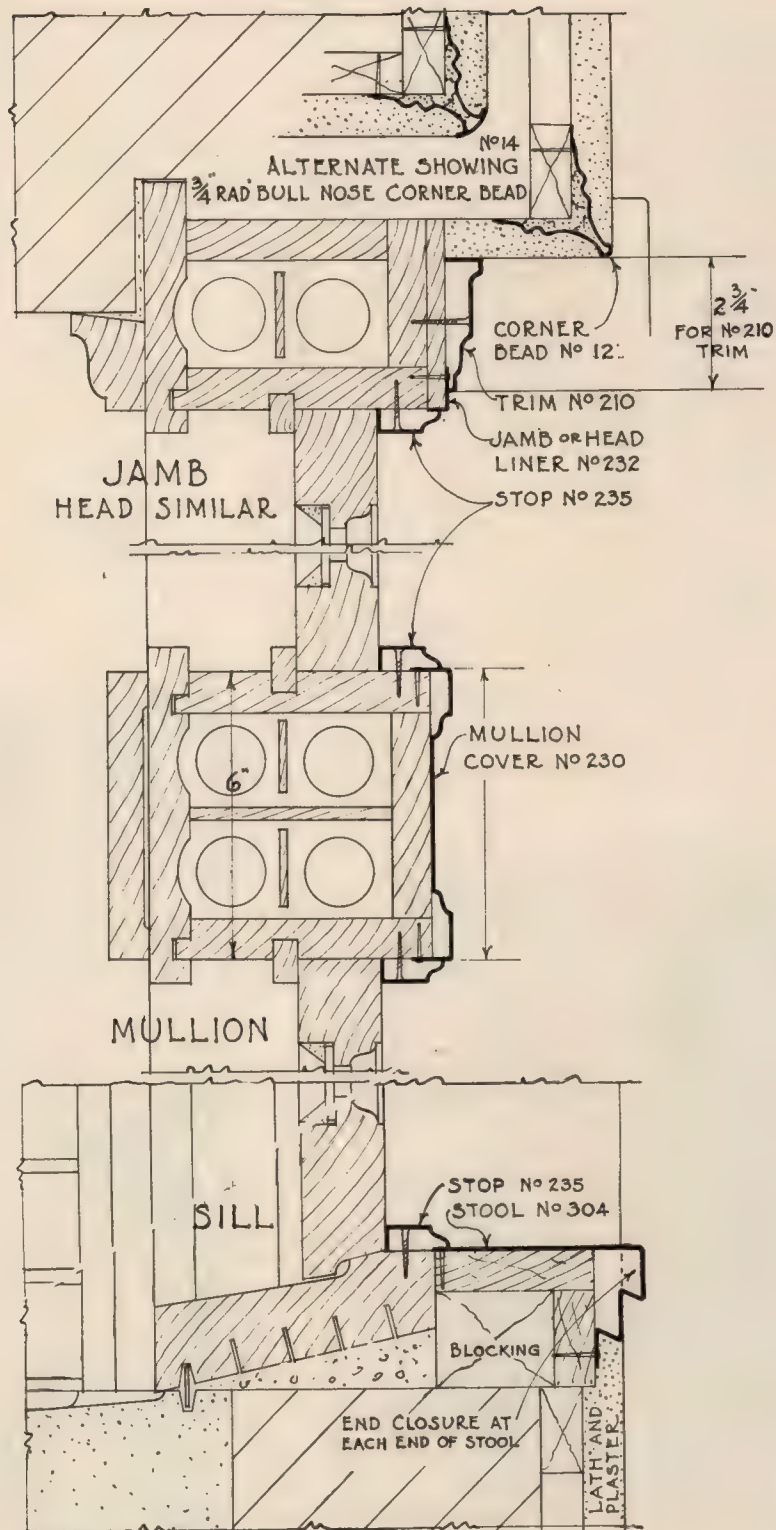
DETAIL OF STEEL CASEMENT SASH IN FRAME WALL
